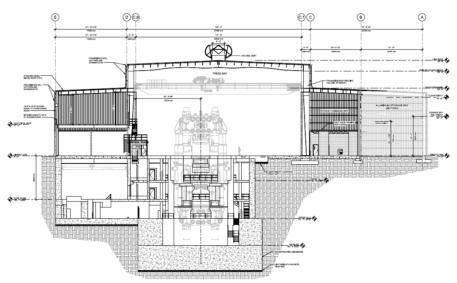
Building cross-section showing the hydraulic press and related equipment.
